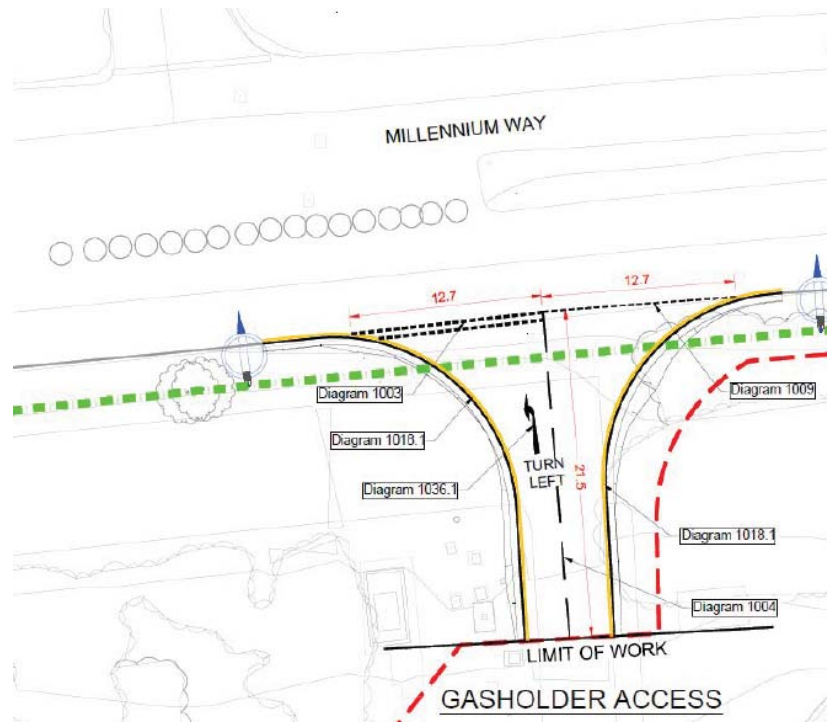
Location of SGN Access 1 – Gasholder Access works
